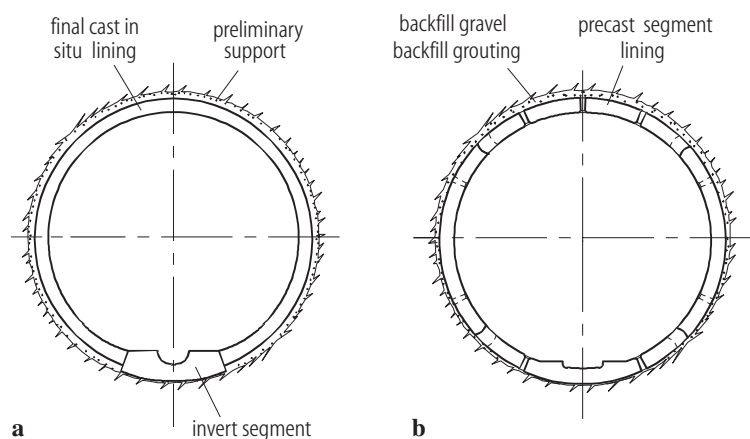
Typical cross sections. (a) In situ lining. (b) Precast segment lining.
